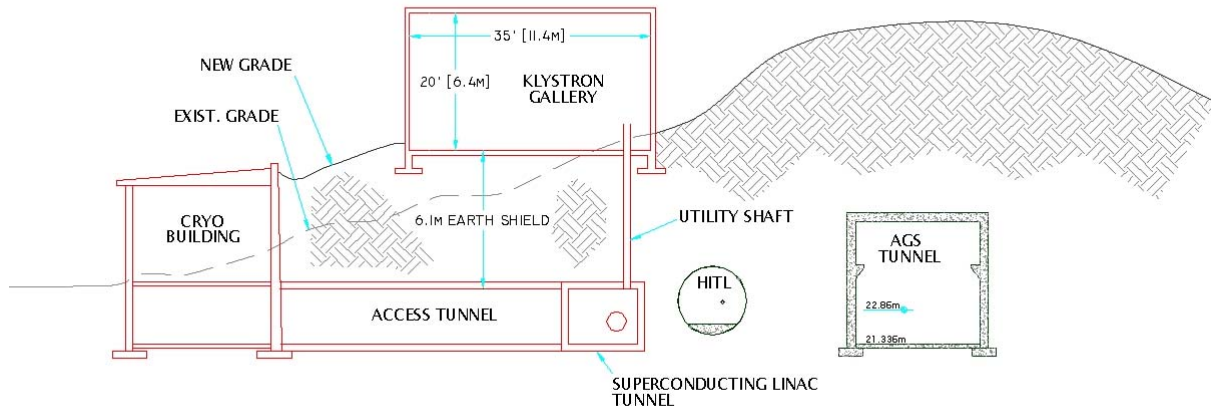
Cross section - superconducting linac, klystron gallery, cryogenic area and access tunnel
